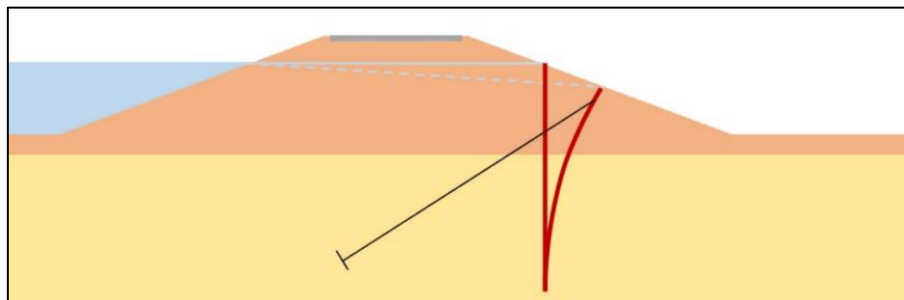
Flexible sheet-pile wall (Podt, 2024)
